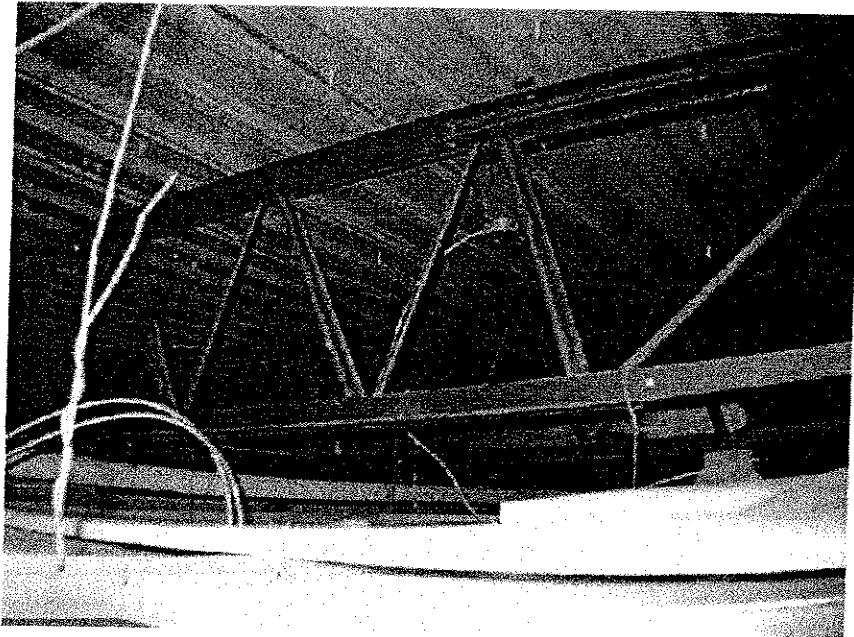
Joist J1 - Note Local Reinforcing Due to Transition to Two Story High School
